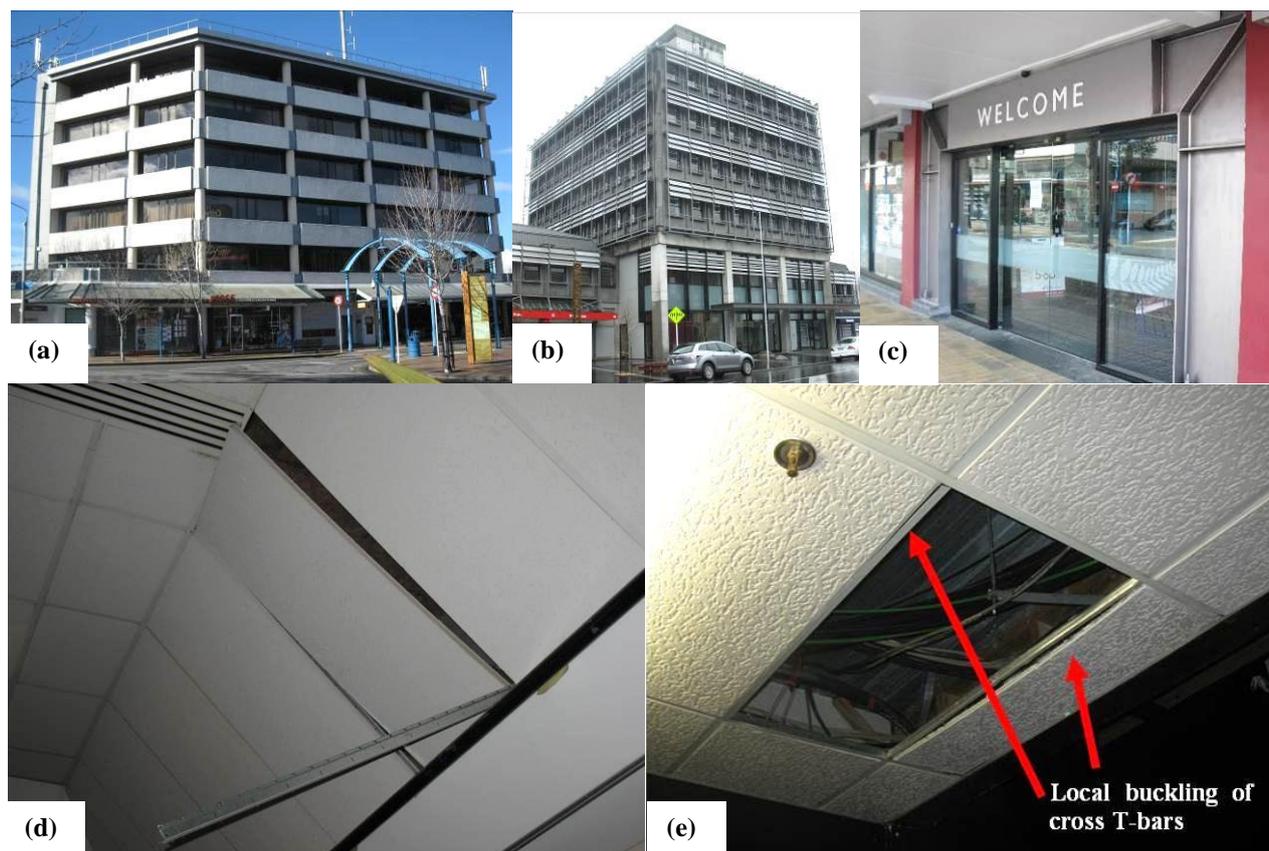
The largest commercial buildings in the Blenheim CBD: (a) Porse House; (b) Rangitane house. (c) One of several two-storey buildings retrofitted earlier in 2013. Observed failure of ceiling system grid members due to: (d) rivet connection failures; (e) local buckling of grid members resulting in falling tiles.
